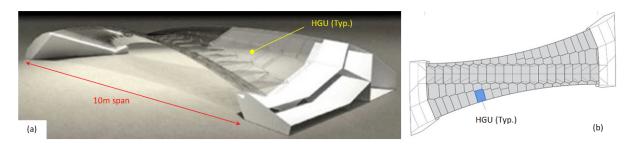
Proposed all-glass pedestrian bridge. (a) Isoparametric view, (b) Plan view
